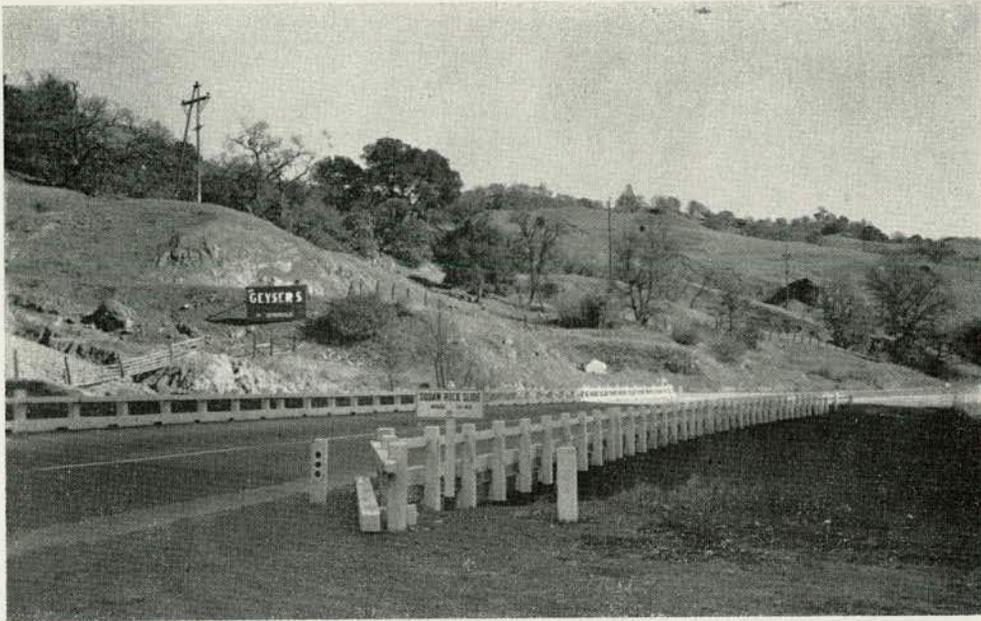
Landslide avoidance by bridging. Bridge on piling constructed across foot of active landslide near Hopland, Calif. Bridge incorporates provision for realigning superstructure if further sliding should cause shifting of piles. (Photograph courtesy of California Division of Highways)
